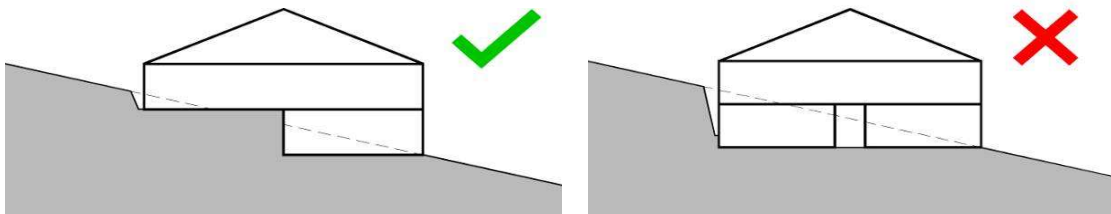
Habitable rooms are to have ample openings to an external wall for air and light.
